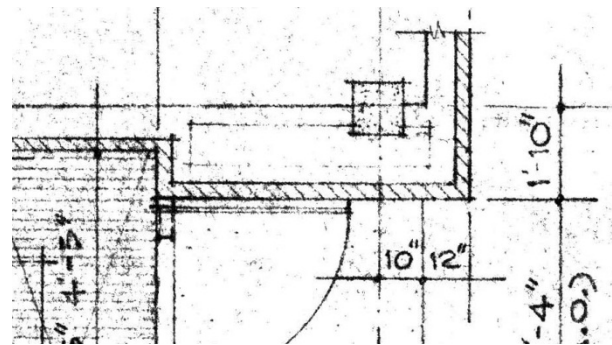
Enlarged plan at step in brick veneer wall at typical entrance / stairway. [From 1968 Drawing A-23.]
